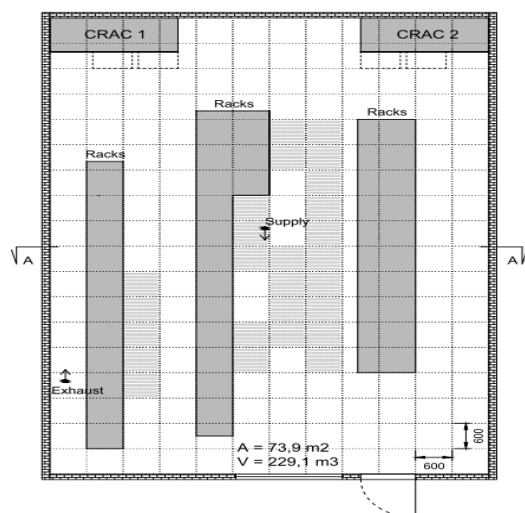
Floor plan and layout of the study data center. The pointed arrows denote approximate locations of the supply and exhaust ventilation ducts
